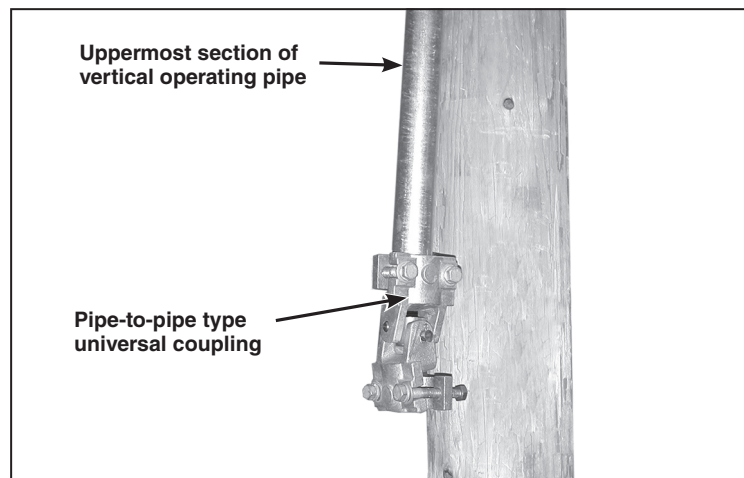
Attach the pipe-to-pipe type universal coupling to the lower end of the vertical operating pipe.
